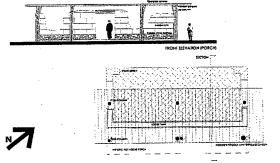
The "wall ruin": interpretation of the 1821 Adobe, Plan and Elevation
